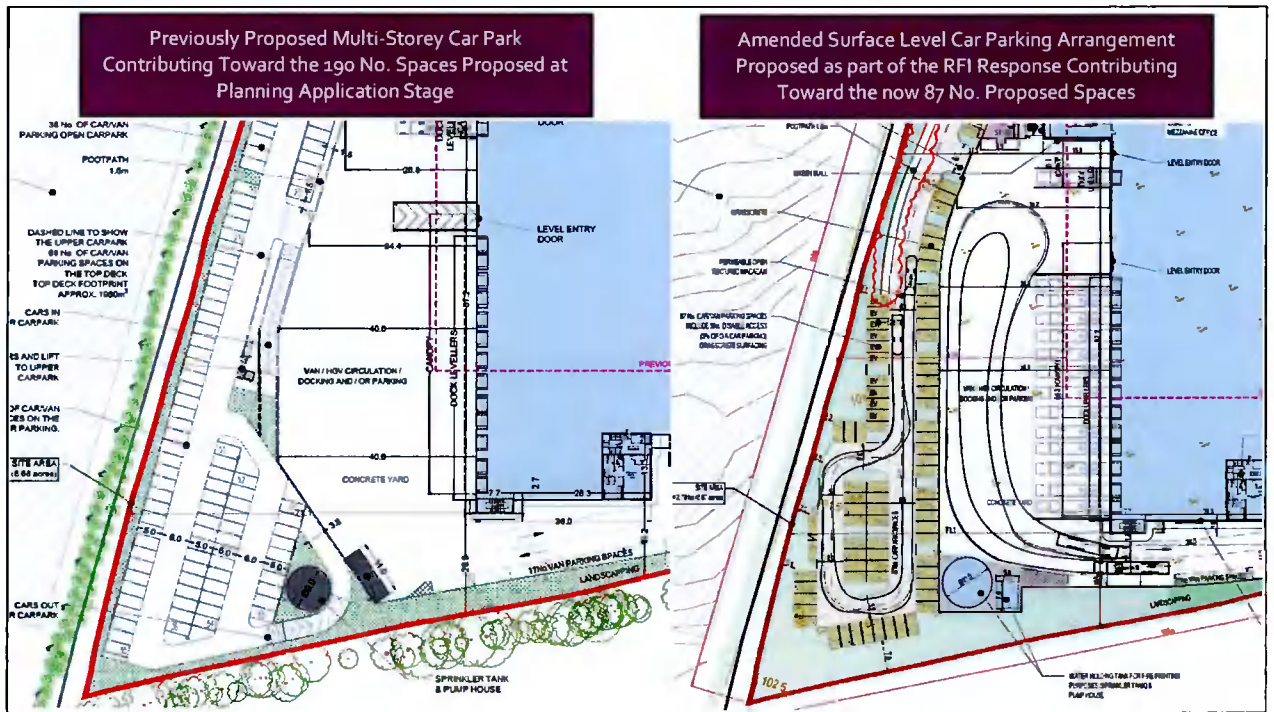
Extract from Proposed Site Plan Proposed as Part of Planning Application Stage (Left) and the Site Plan Now Proposed at RFI Stage (Right)
